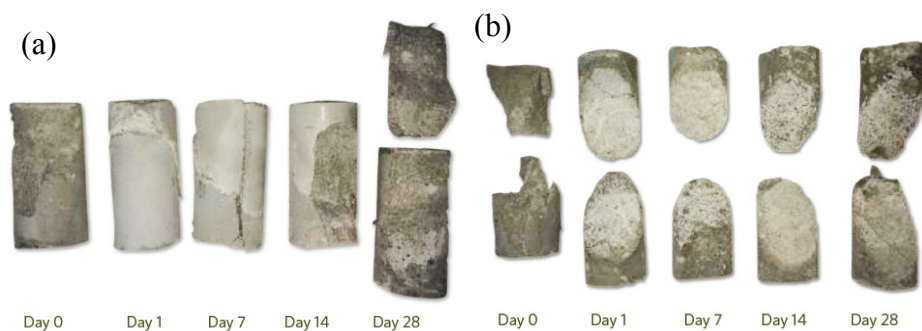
(a) Geopolymer samples showing compression failures located away from the joint (b) OPC samples with compression failure located at the joint.
